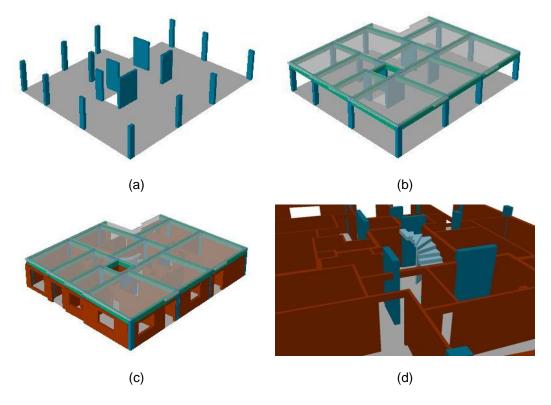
3D view of data layers in ArcScene, (a) Columns, (b) Columns, beams and slabs, (c) General floor view, (d) Interior details.
